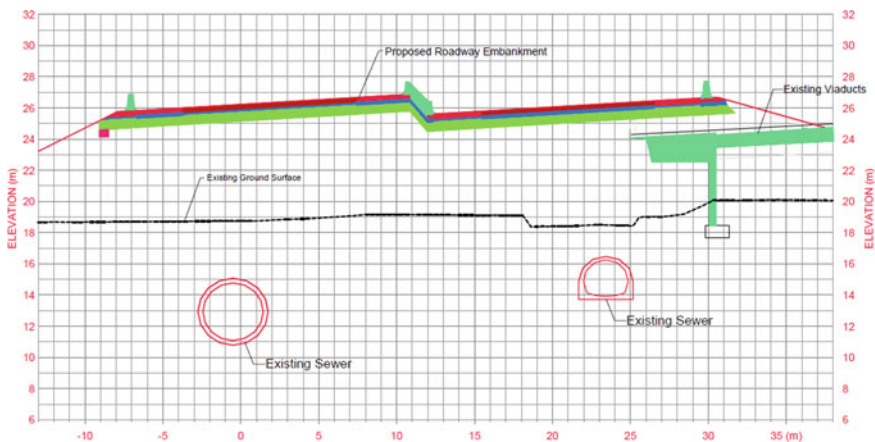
Existing condition and proposed roadway embankment relative to existing grade
